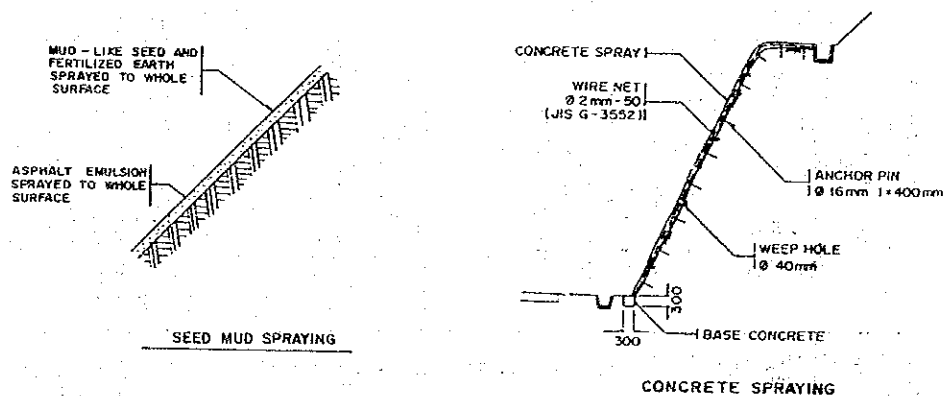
MORTAR AND CONCRETE SPRAYING
